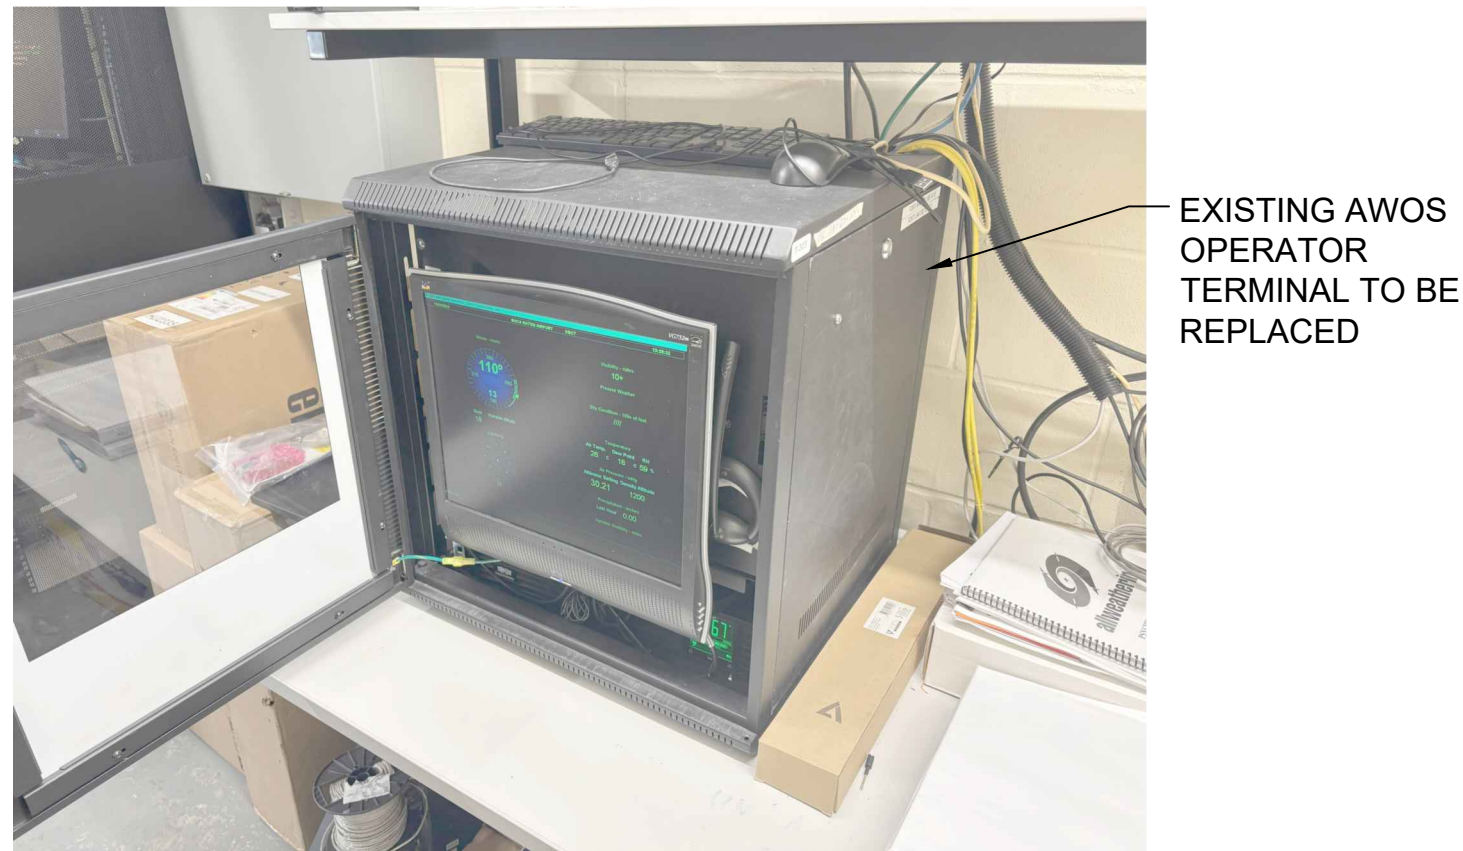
2ND LEVEL EQUIPMENT ROOM
